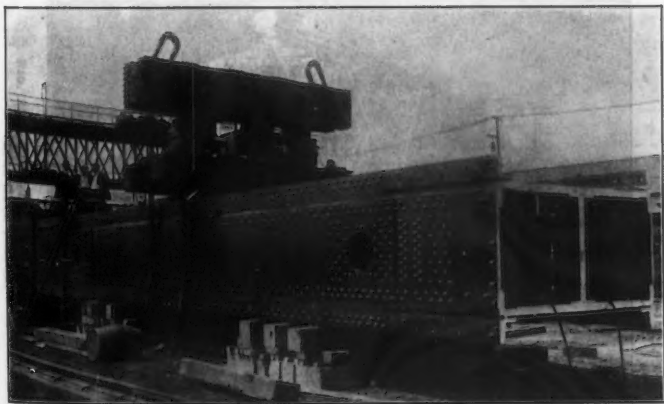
BOTTOM CHORD SECTION WITH LIFTING DEVICE, HELL GATE BRIDGE.
